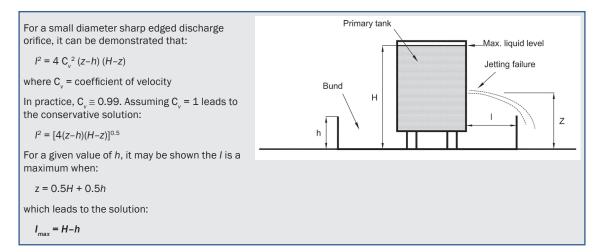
shows an example of an installation vulnerable to jetting failure.
